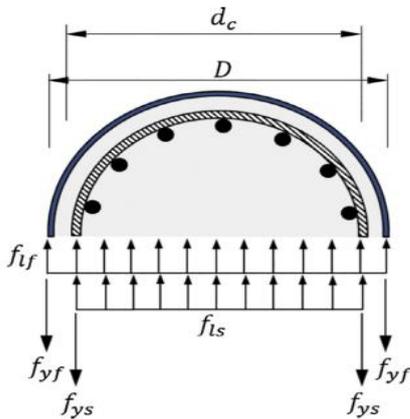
Confining mechanism for concrete confined by FRP and steel [18].
